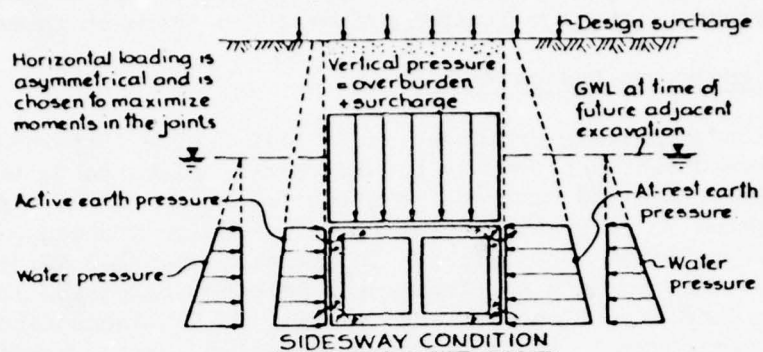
DESIGN CRITERIA FOR LOADS ON CONCRETE BOX SUBWAY STRUCTURE FOR WASHINGTON METRO (After Gould, 1970)
